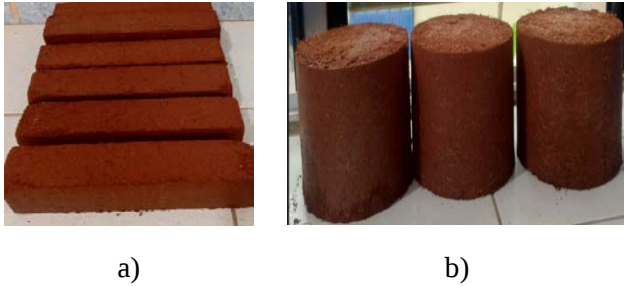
Prepared test tubes: a) 4x4x16 cm³ test tubes; b) Cylindrical test tubes
